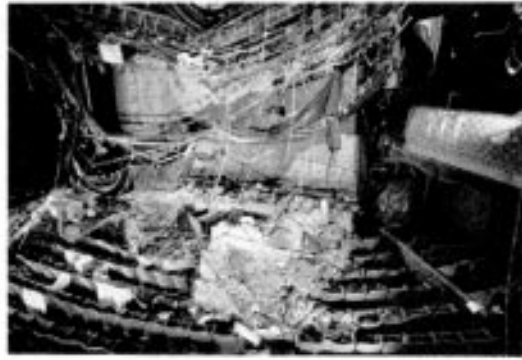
Ceiling collapse in theater (From Benuska, 1990)
